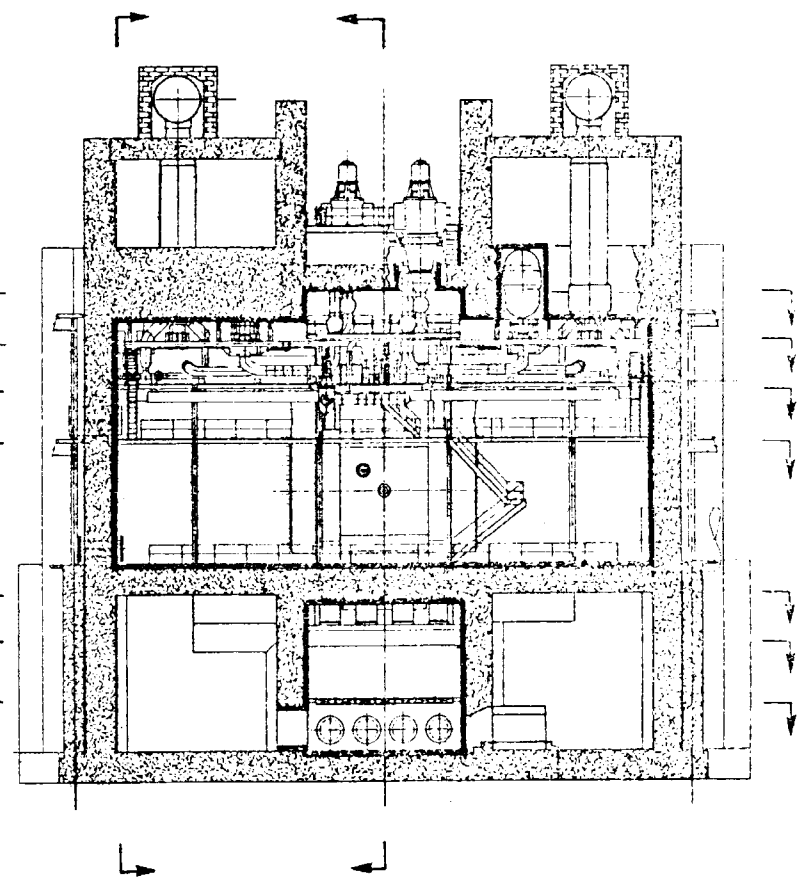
Pickering G.S. Reactor Building - Elevation
